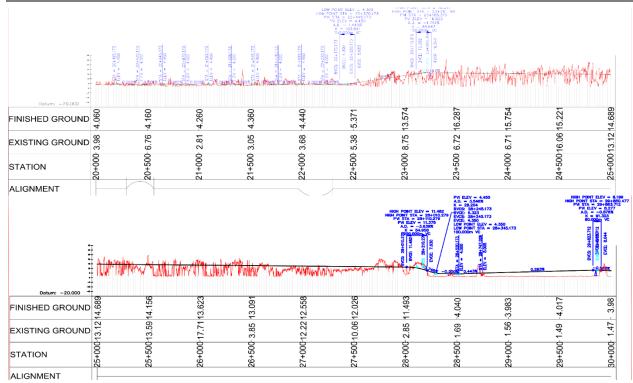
Alignment Profiling of the Proposed Coastal Road (20+000 to 30+000)
